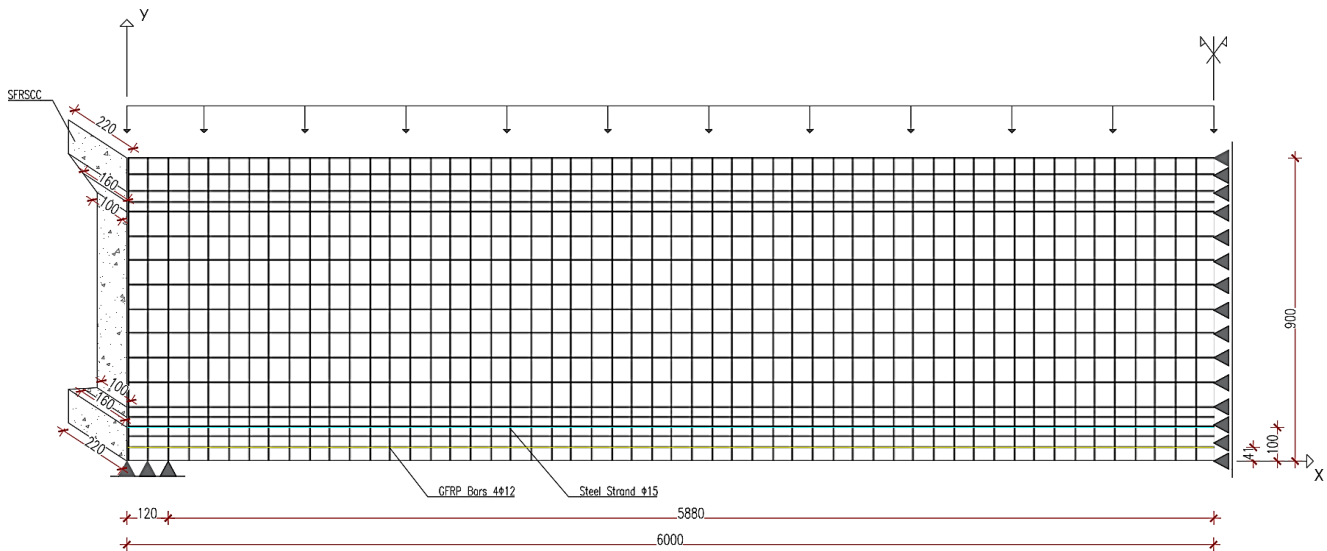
Geometrical details of the hybrid SFRSCC beam reinforced by prestressed steel strand and GFRP bars (dimensions in mm).
